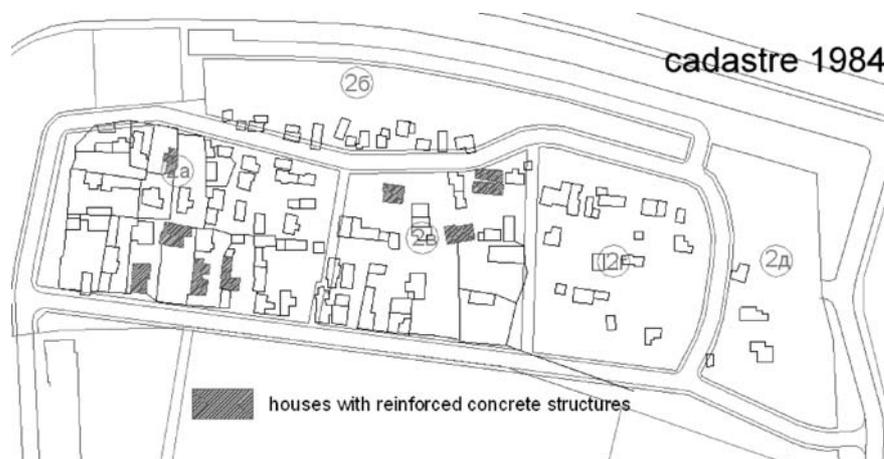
Cadastral plan 1984 – solid houses built by 1984.
